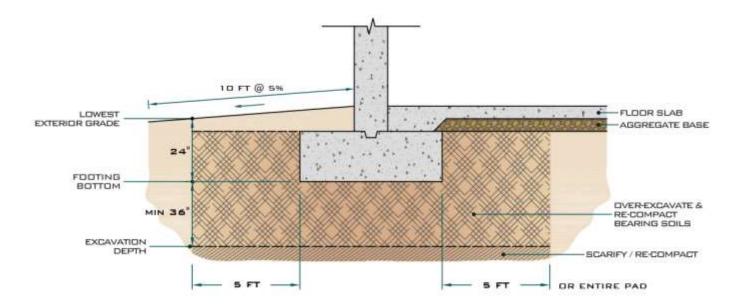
Foundation Detail – Bearing on Engineered Fill
